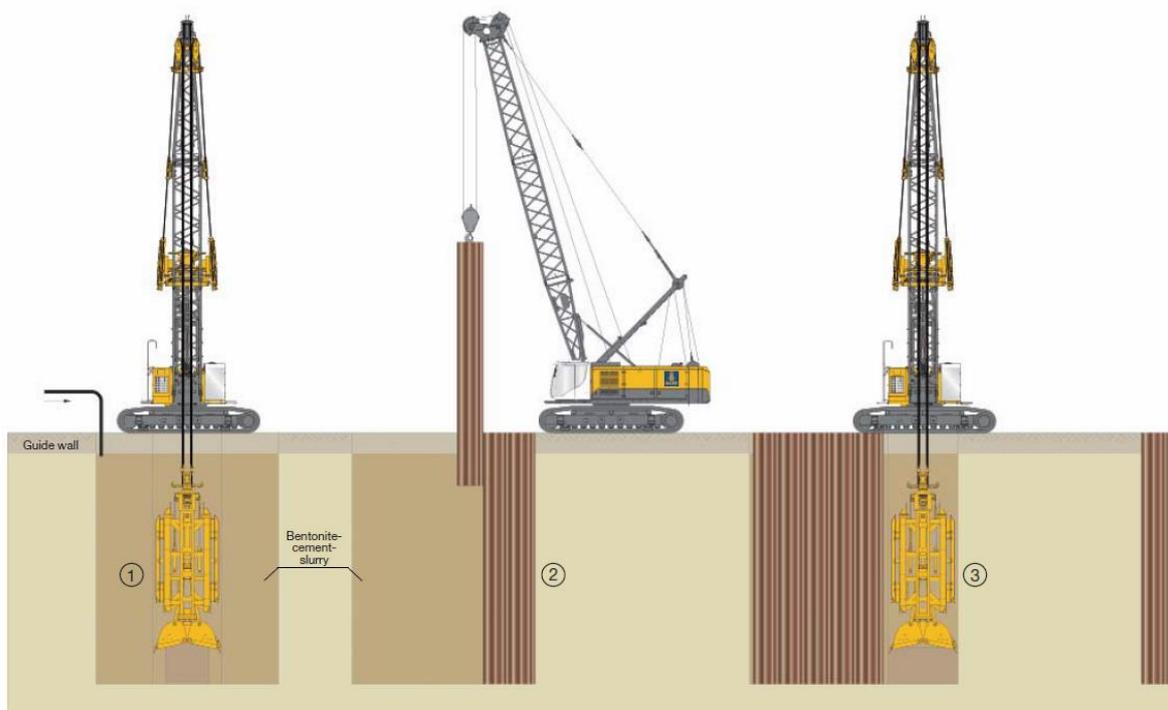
1 phase diaphragm wall with sheet pile walls (*Bauer*)
